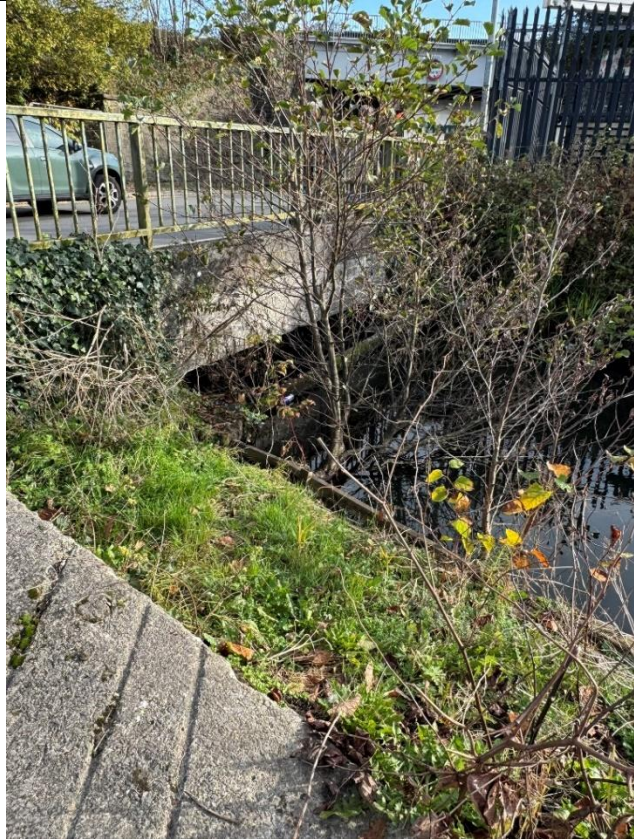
Bridge Street Bridge with low head room unsuitable for navigation
